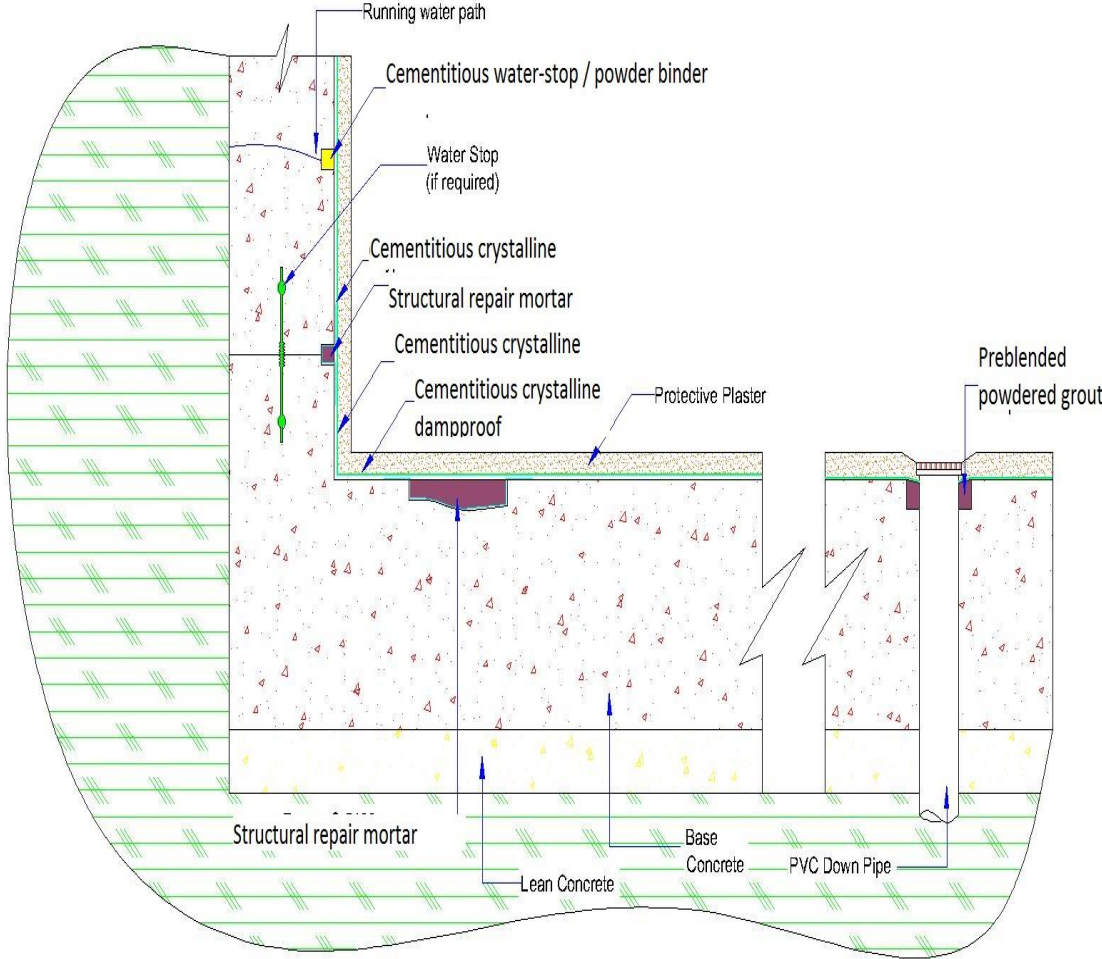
Internal Waterproofing of Basements, Underground Sumps, Swimming Pools, Lifts, Tanks and Reservoirs
